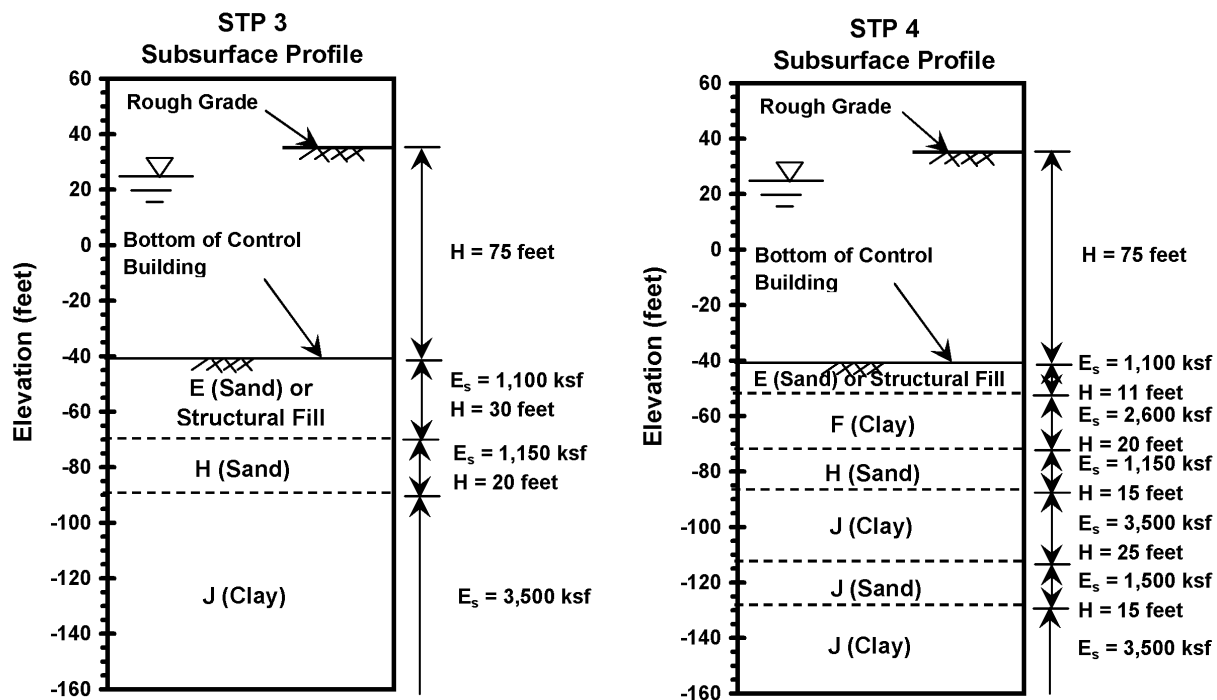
S.4-68 Adopted Subsurface Profiles for the STP 3 & 4 Control Buildings
